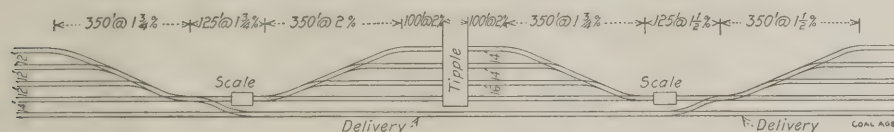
COMPLETE TRACK LAYOUT, EMPTY AND LOADED SCALES
